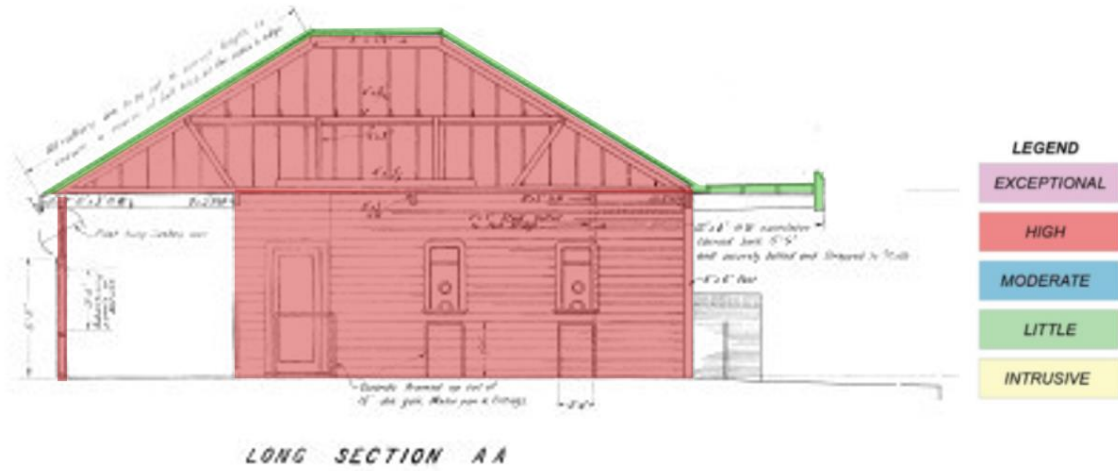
Element gradings of the south-western (front) elevation of the Denistone Station Conveniences Building (Source: RailCorp in Arcilla, Gupta and Binkhorst 2019. p. 17, additional assessment by Artefact 2021)
